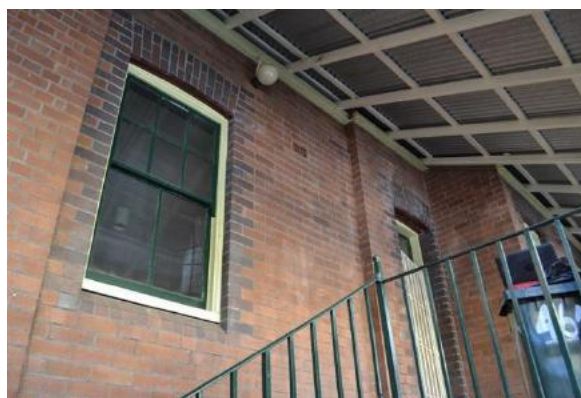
Front façade of flat 46A showing face brick external wall with contrasting brick surrounds to window and door openings and chamfered brick window sill. (Source: GML Heritage, July 2016)
